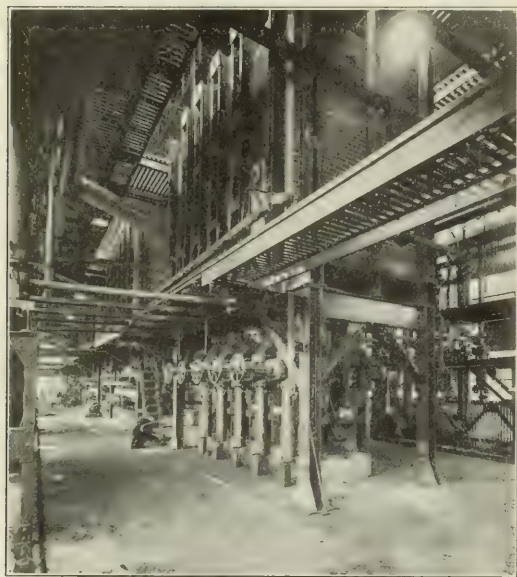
FIG. VII—GROUND FLOOR VIEW OF FURNACE BUILDING, SHOWING ARRANGEMENT AND BUILDING OF FURNACES NOT COMPLETED, AETNA CHEMICAL CO.
